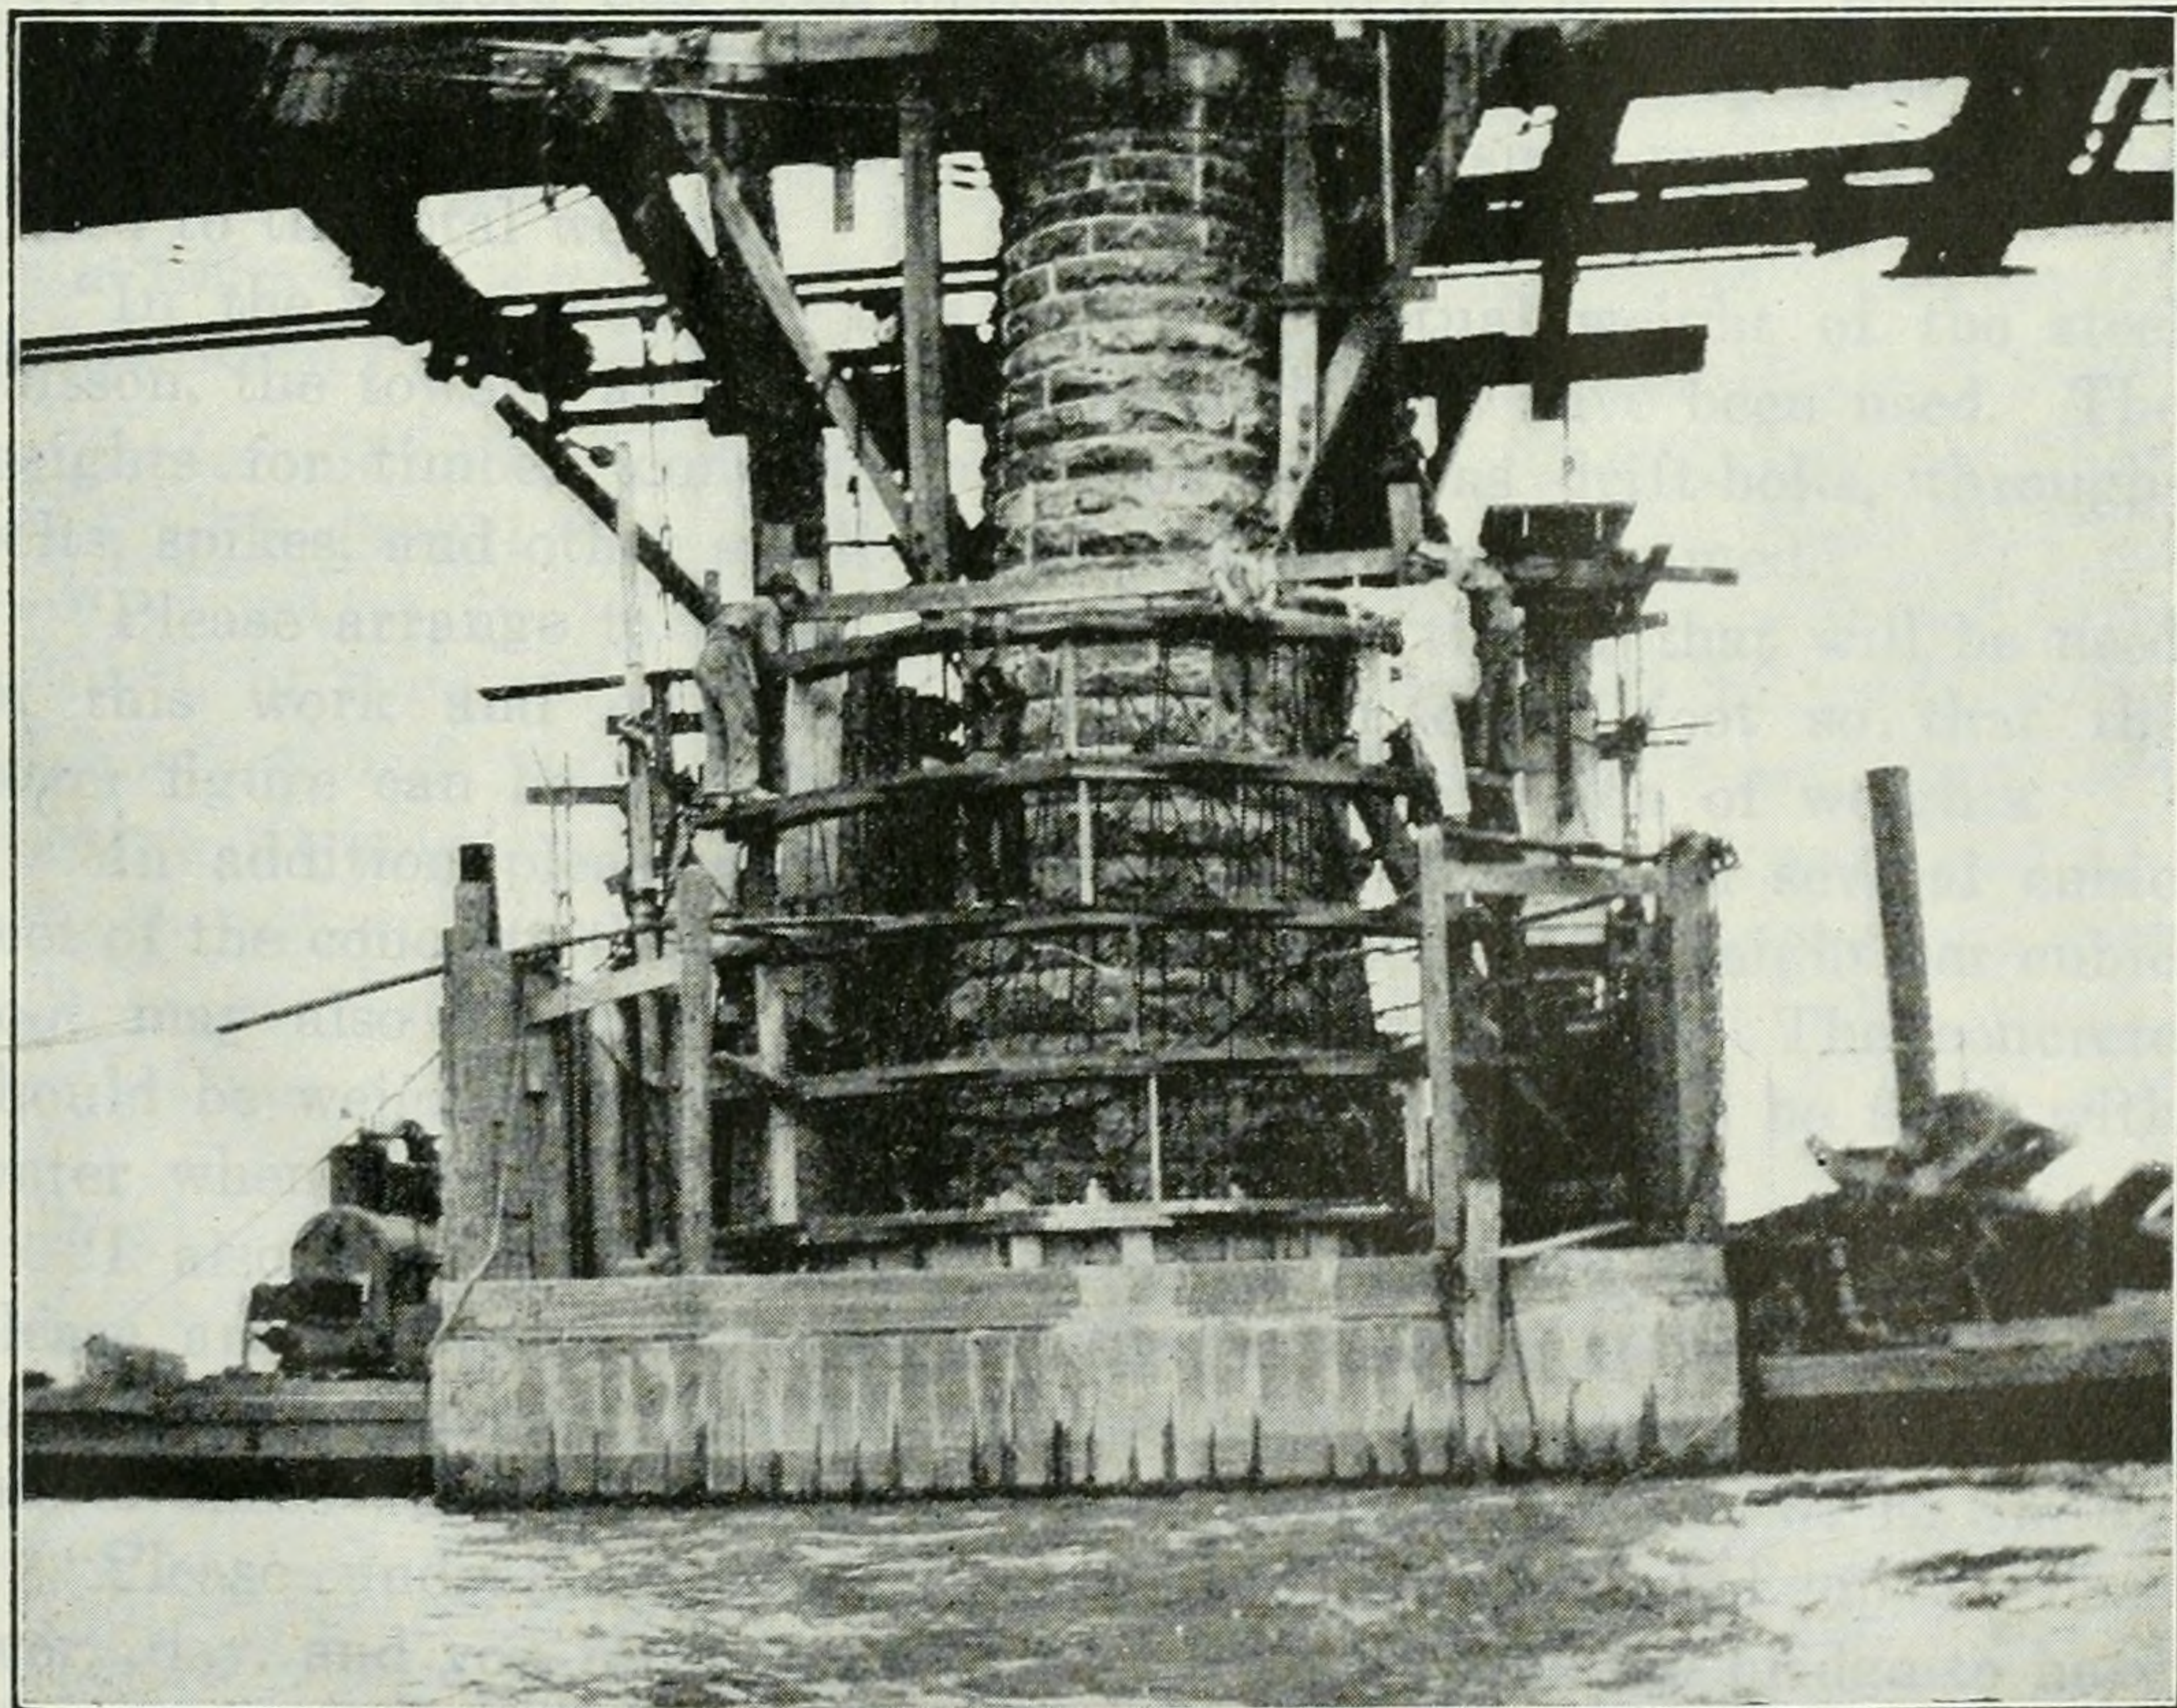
STEEL CAISSON AND COFFER-DAM AROUND PIER 3.
